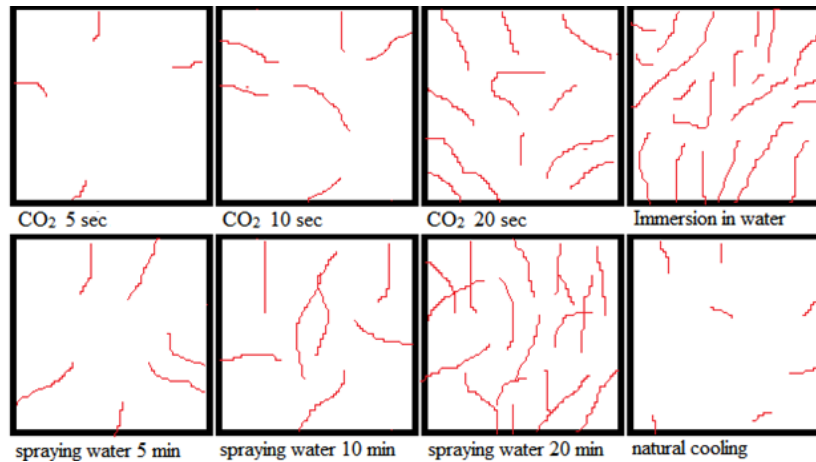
(a). Retouched images of cracks developed at the surface of plain concrete specimens at 600 °C.
